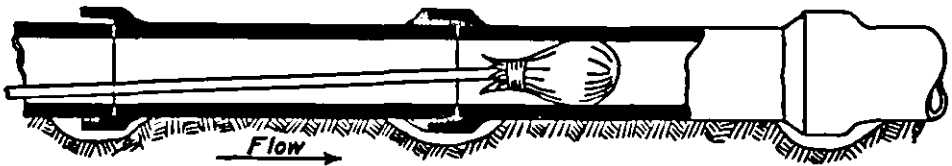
Laying terra cotta sewer pipe from septic tank towards house. Oakum is used to center pipe and hold cement. Note dug-out space under bells to permit tight cement joints. Room for the workman's hand must be provided.
